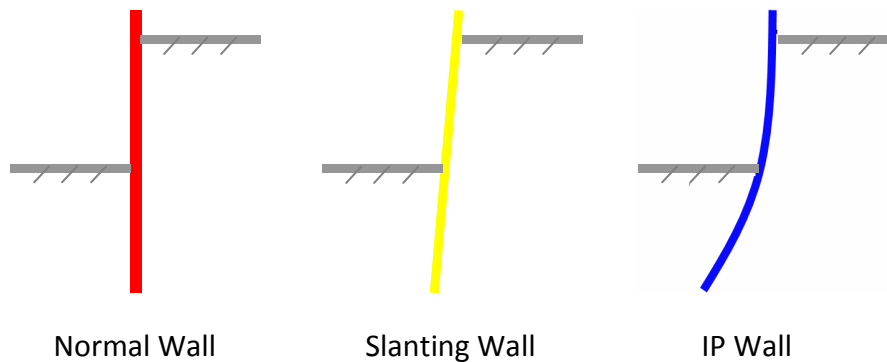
Comparing Normal Wall, Slanting Wall and IP Wall
